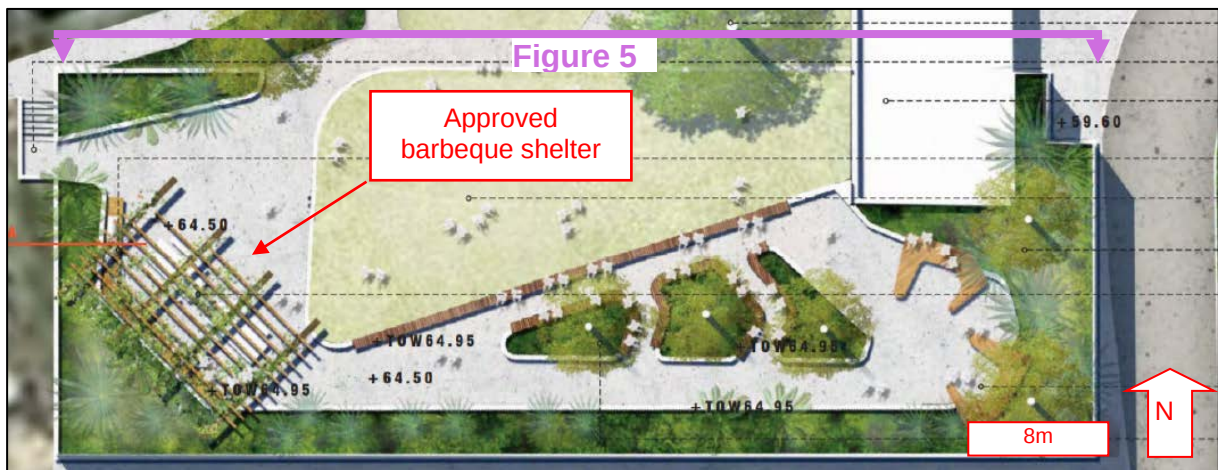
| Approved roof terrace layout plan (Source: Original Modification Application 2017)
